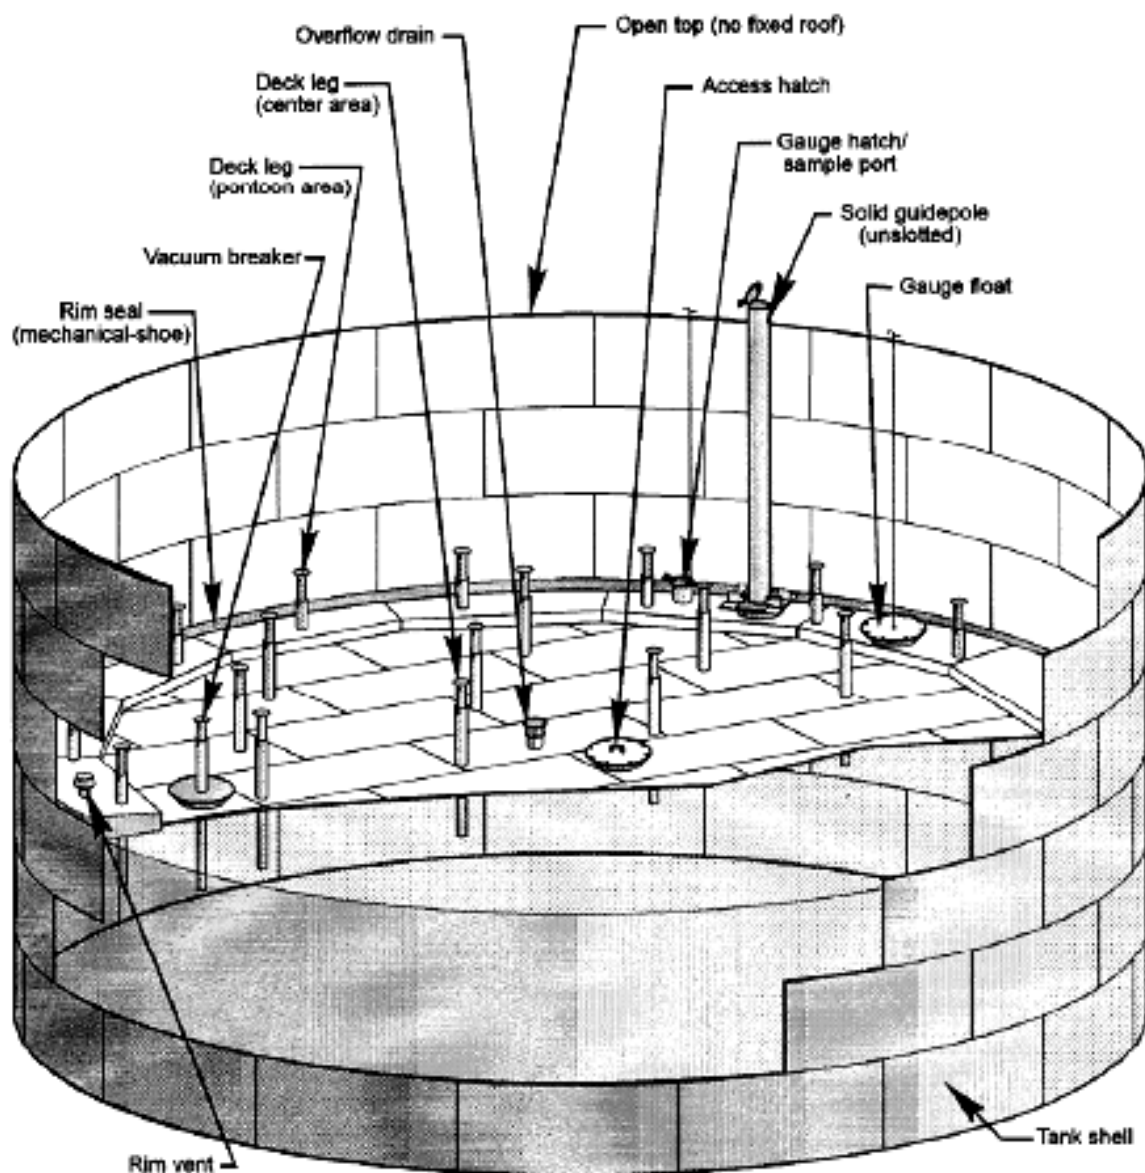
Floating Roof Tank (From AP-42, Section 7.1, U.S. EPA)
